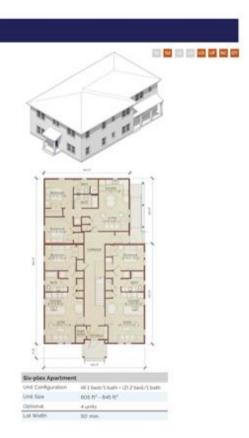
Examples of Floor Plans provided by the City of South Bend, \it{IN}
